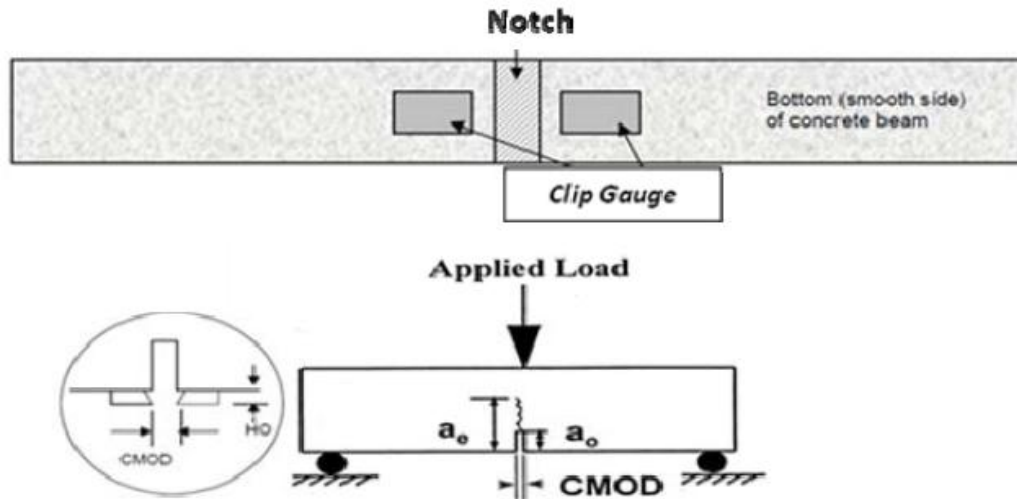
Details of attaching clip gauge to RPC prism which measures crack mouth opening displacement (CMOD).
